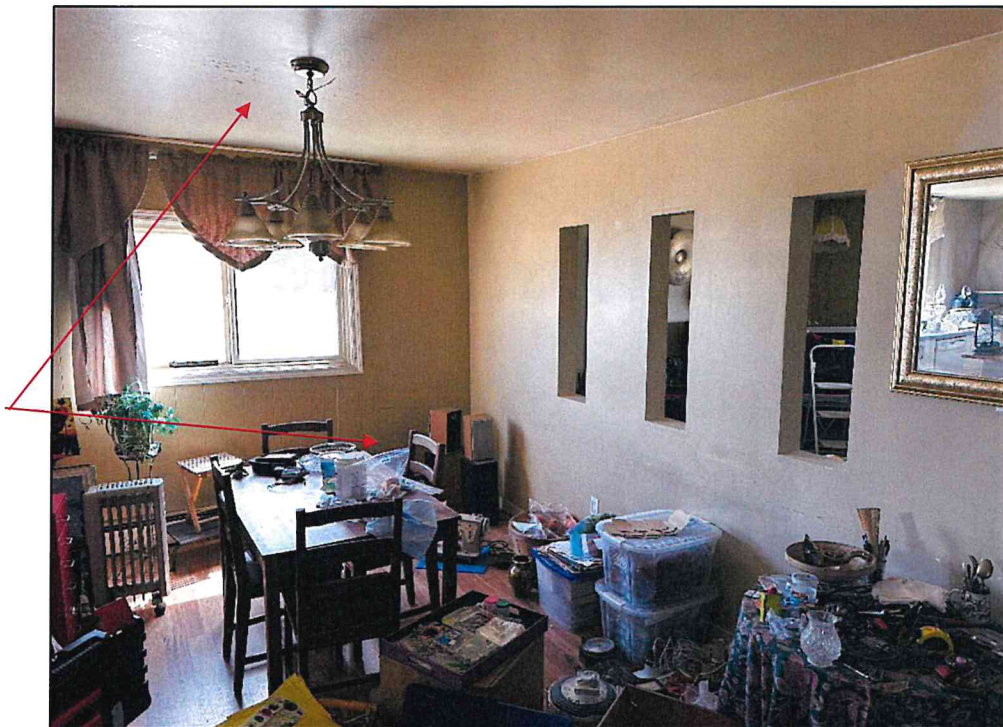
Asbestos-containing drywall jointing compound – Walls and ceilings throughout Site
